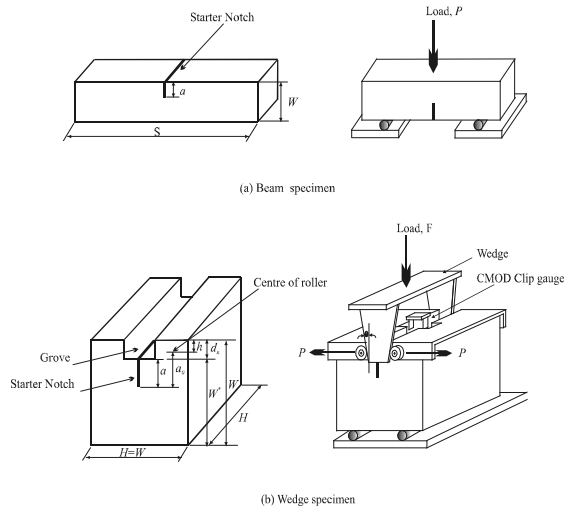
Specimen shapes, dimensions and loading arrangements (a) beam specimen; (b) wedge specimen.
